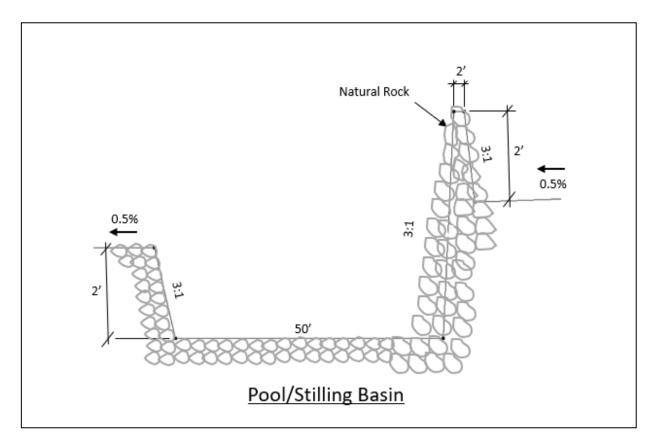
| Typical Rock Stabilization Structure Profile View, Looking West
